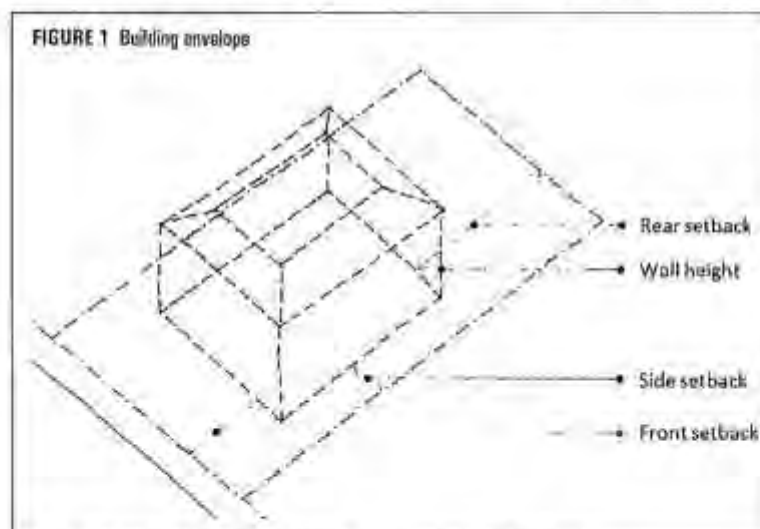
Building Envelope - Extract from Woollahra DCP 2015
